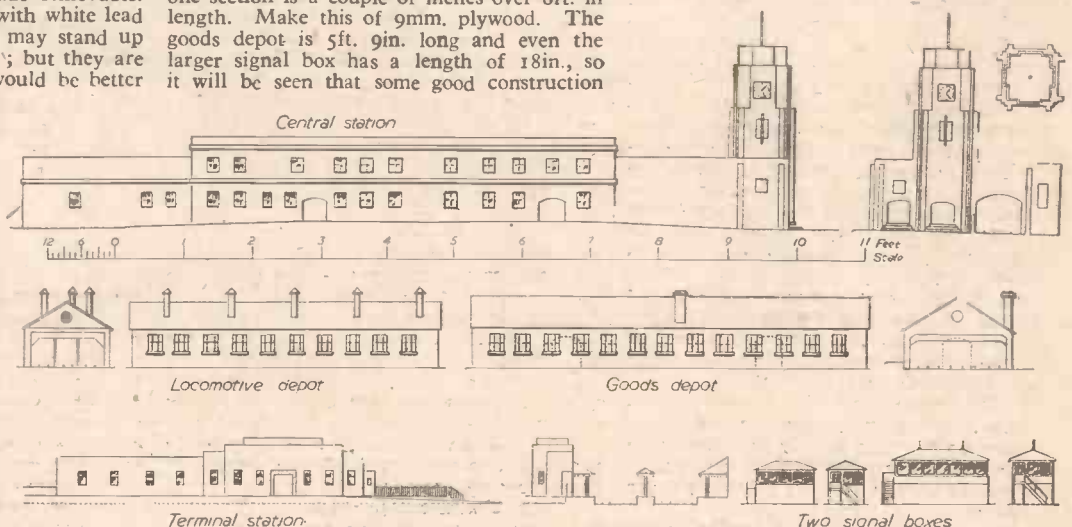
Elevations of buildings shown in the plan, which appeared last month.
